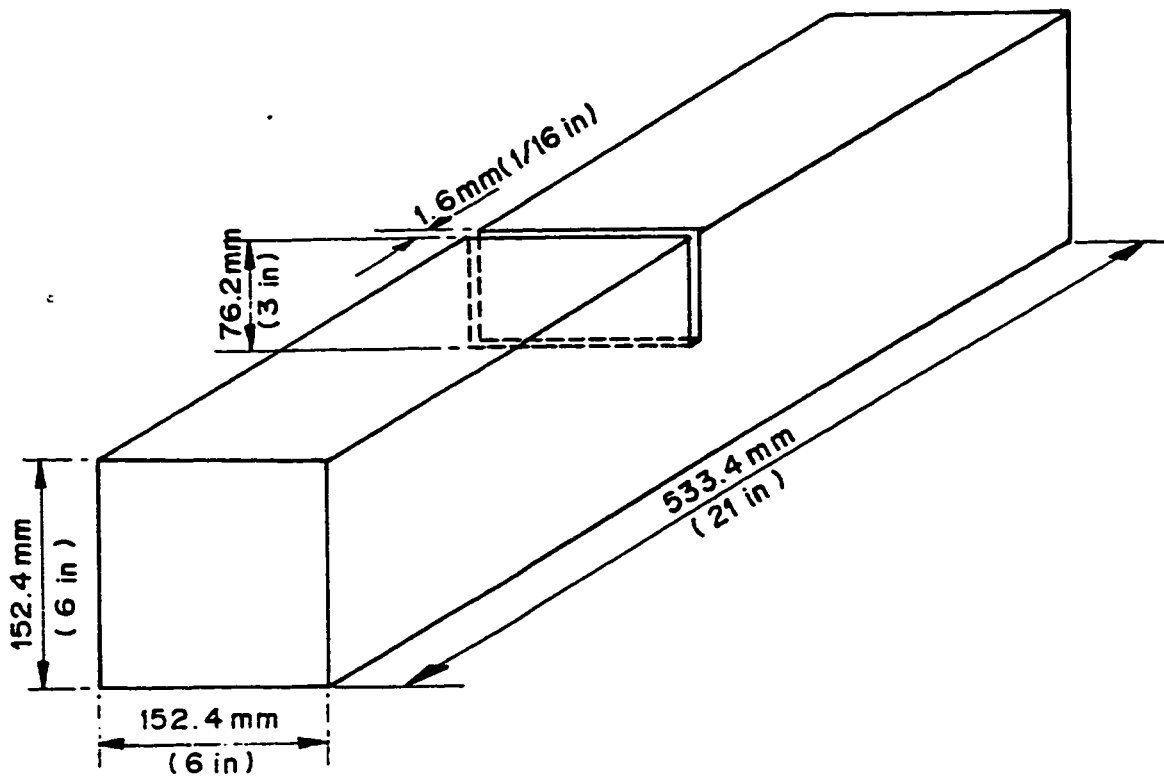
Concrete Beam Specimen for Epoxy Injection
